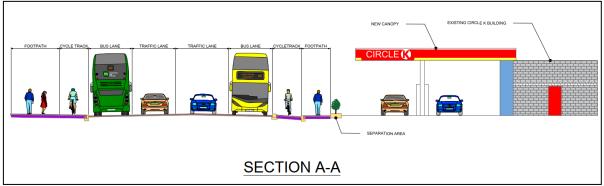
Extract from the Circle K General Arrangement Drawings (Sheet 01)
